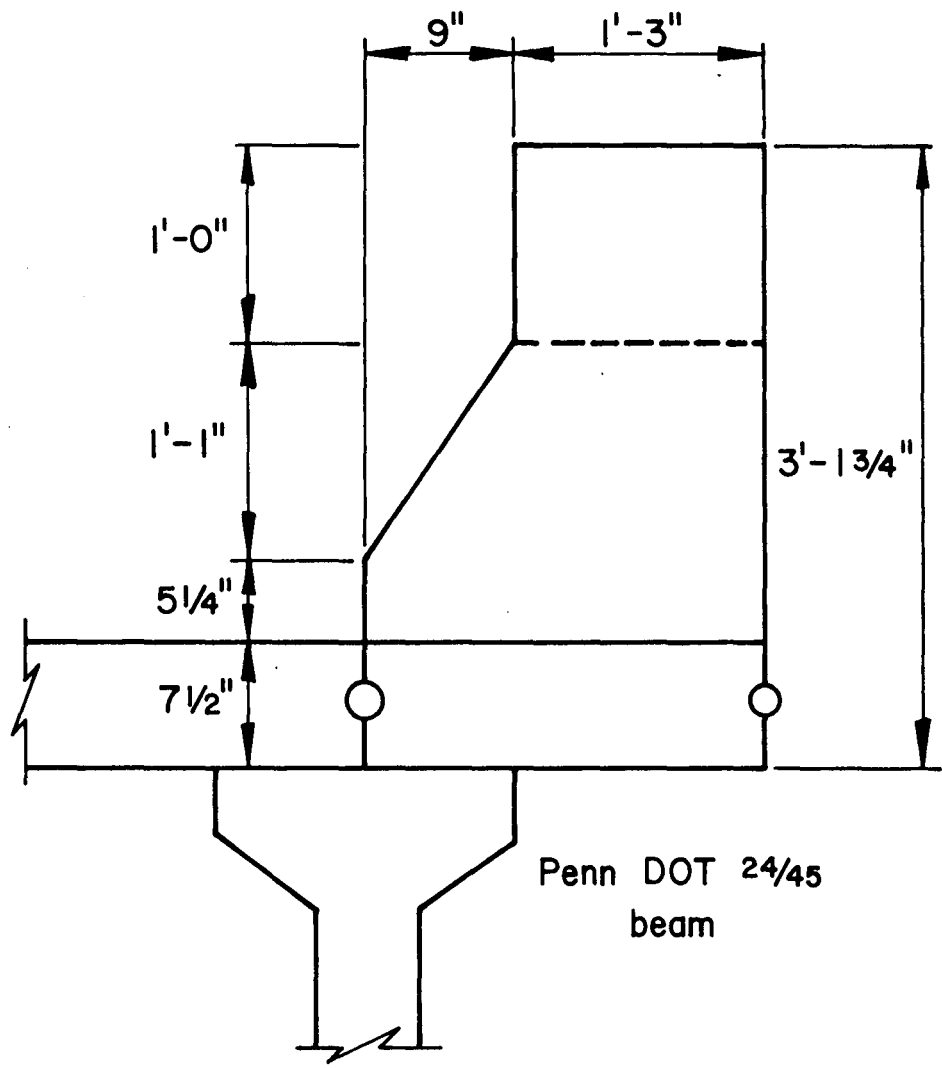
Curb-Parapet Section - Lehighon Bridge
